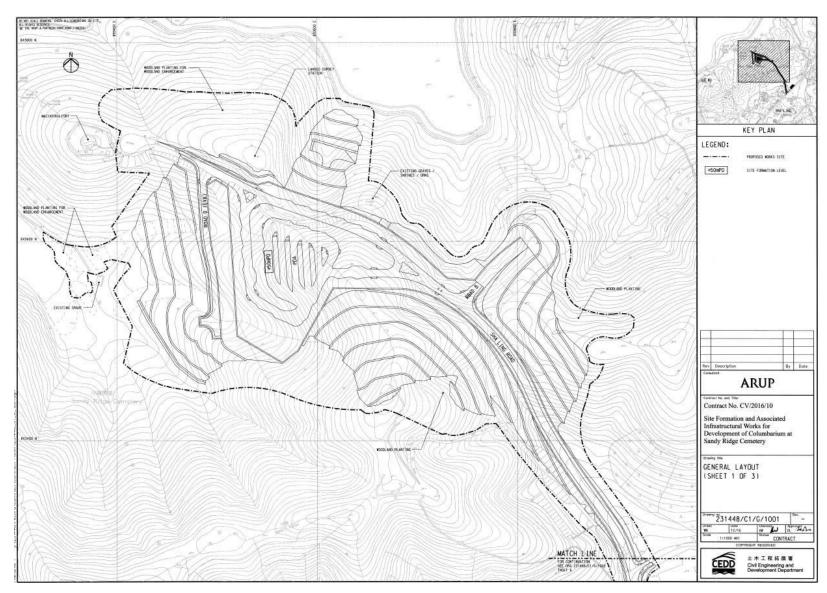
The layout of Contract 1 to be implemented under FEP-01/534/2017/A
